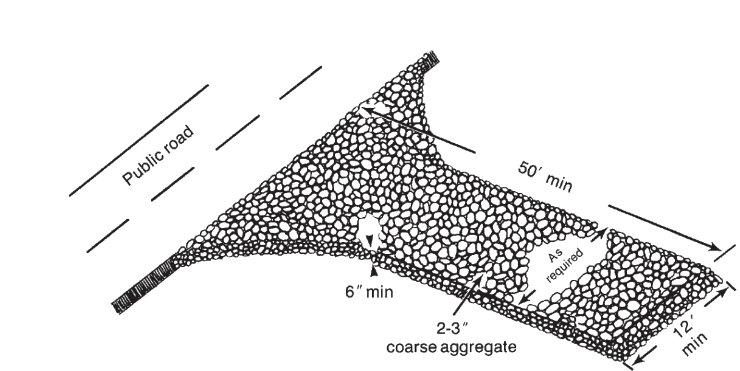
Gravel entrance/exits layout showing the construction site (modified from NCDOT).
